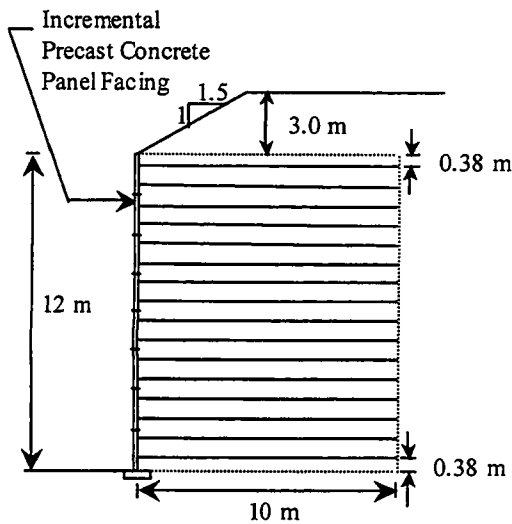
Gjøvik, Norway, steel strip MSE wall (adapted from Vaslestad, 1993).
